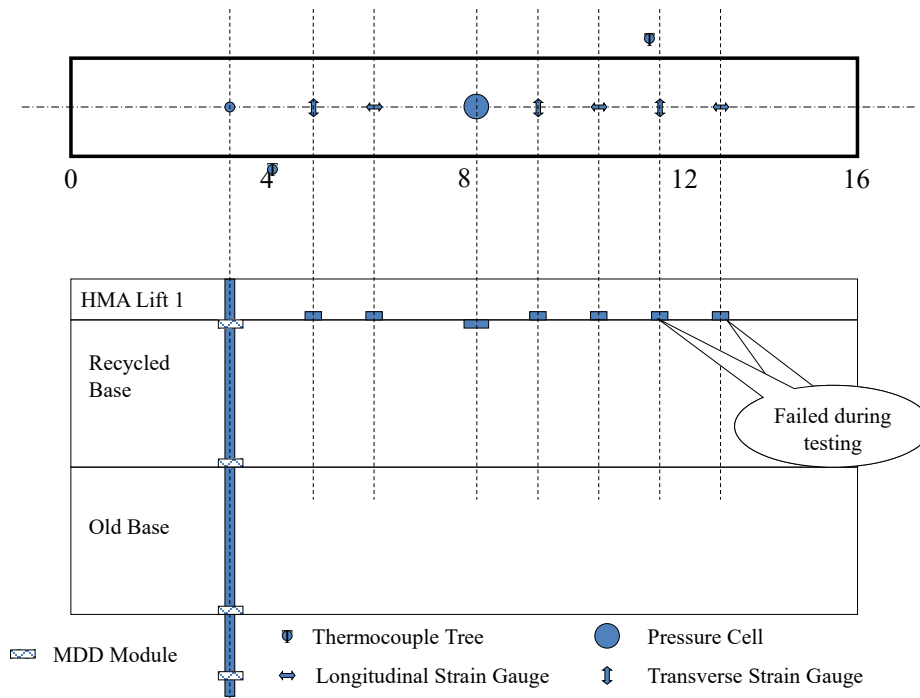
Illustration. Layout of embedded instruments for Section 670HC (one lift of AC).
